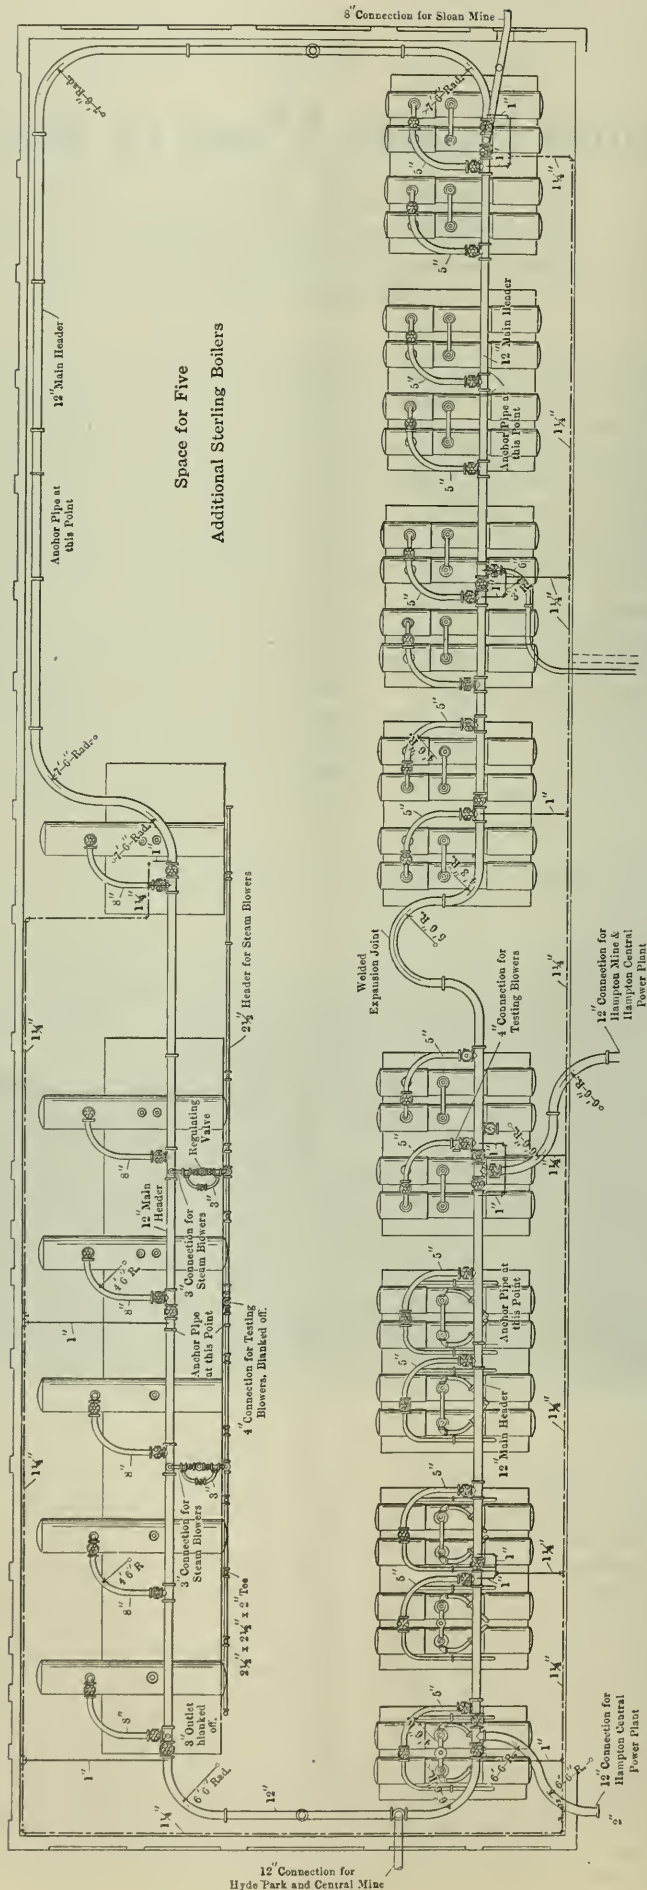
PLAN OF THE BOILER-ROOM LAYOUT AT THE HAMPTON PLANT
